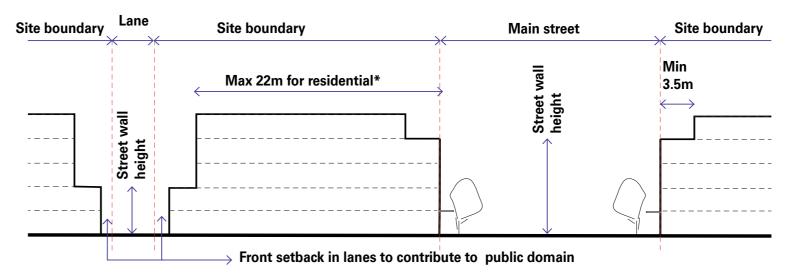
Setbacks, street wall height and separation distances¹ (indicative only)
